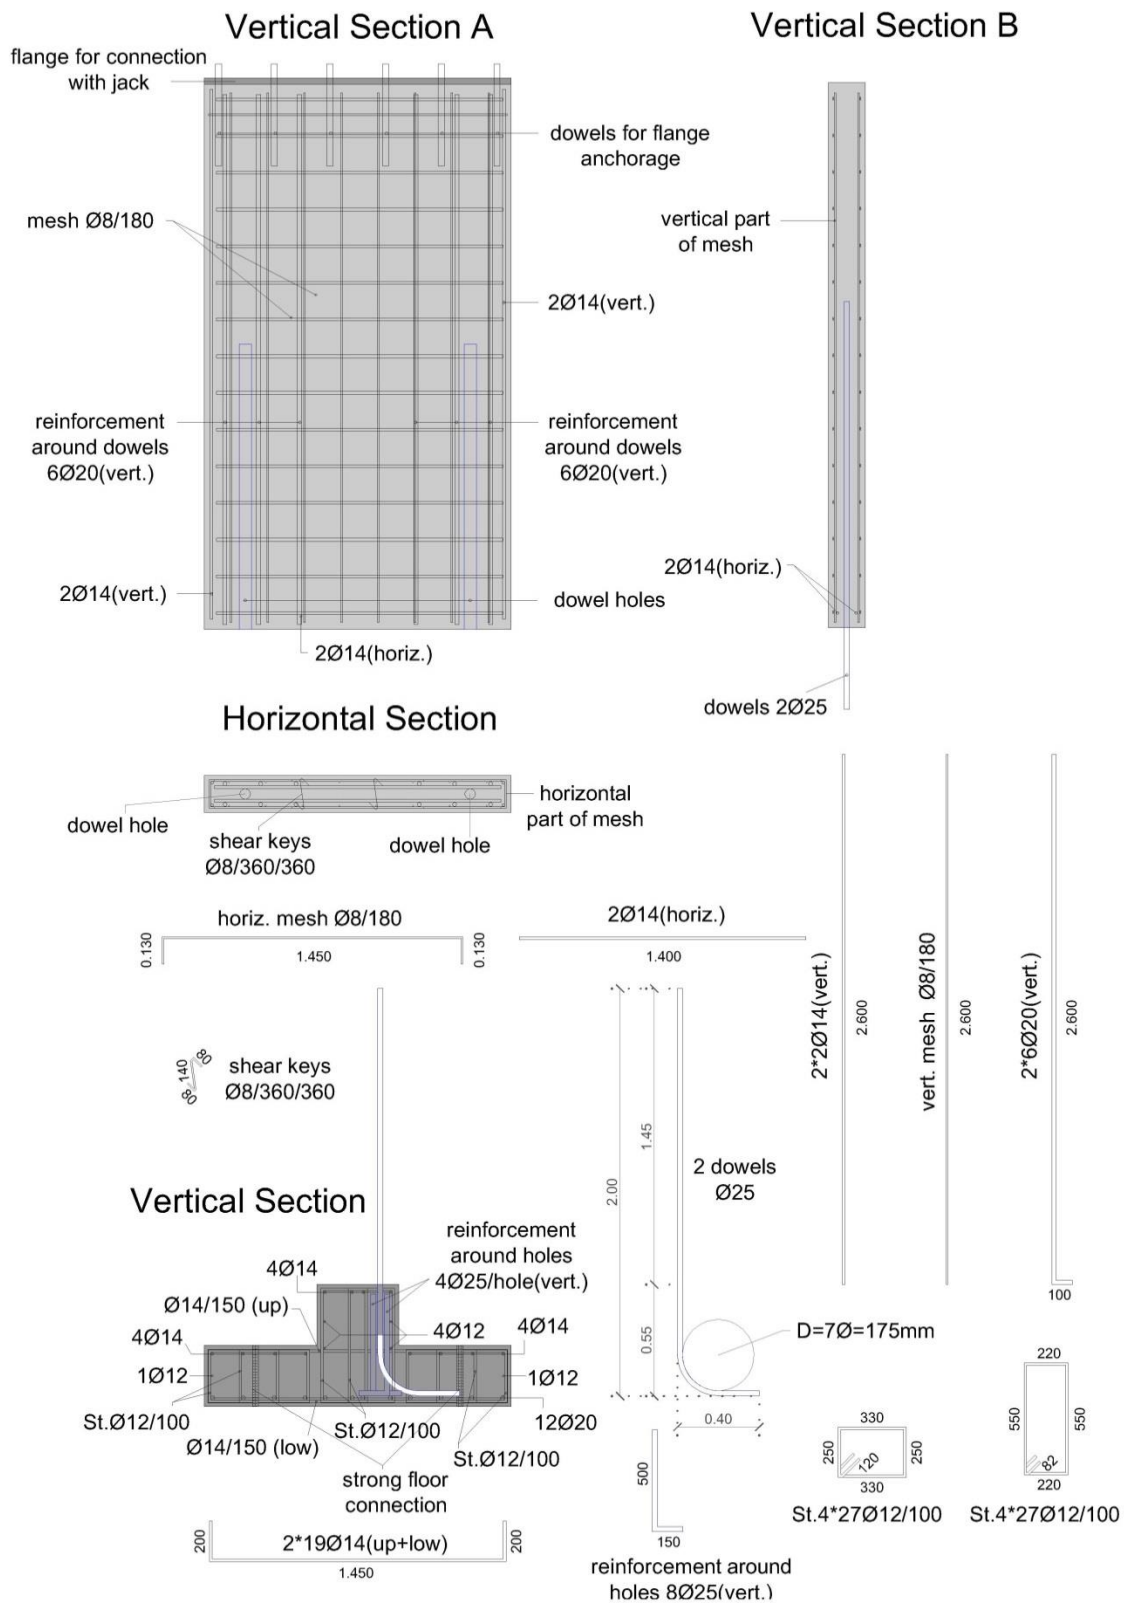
Reinforcement details of specimens 1D25M-G and 1D25C-G.
